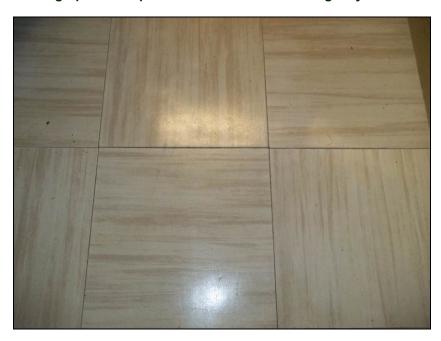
Sample GB-6. Asbestos containing vinyl floor tile.
